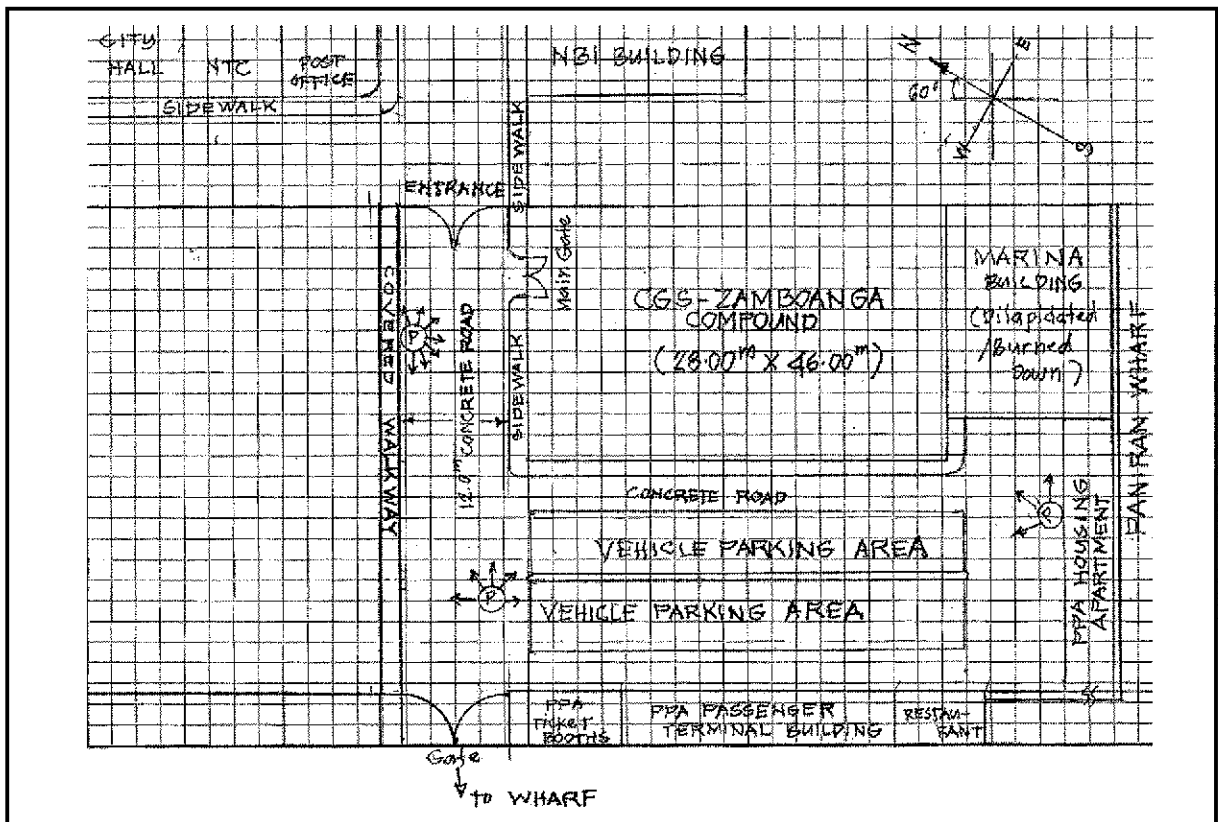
SITE LAYOUT FOR CGS ZAMBOANGA
